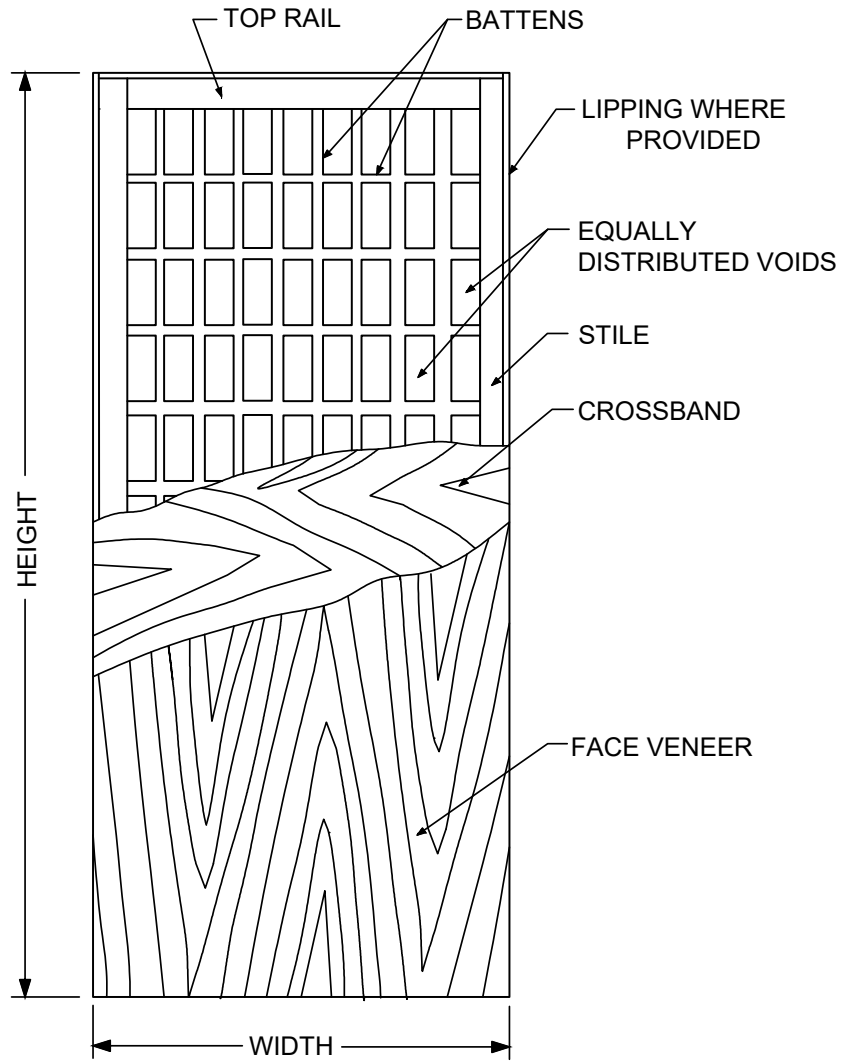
TYPICAL SKETCH OF CELLULAR CORE FLUSH DOOR SHUTTER
